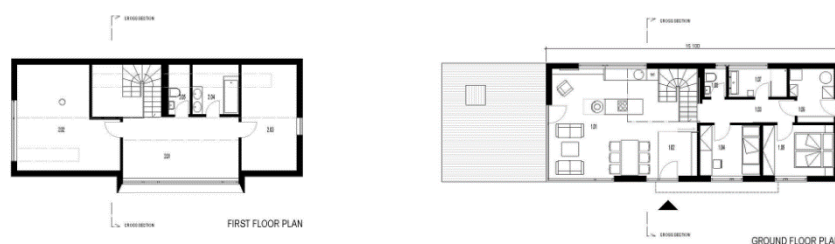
Roprachice House / PRODESI (<http://www.archdaily.com/352481/roprachice-house-prodesi/>).
